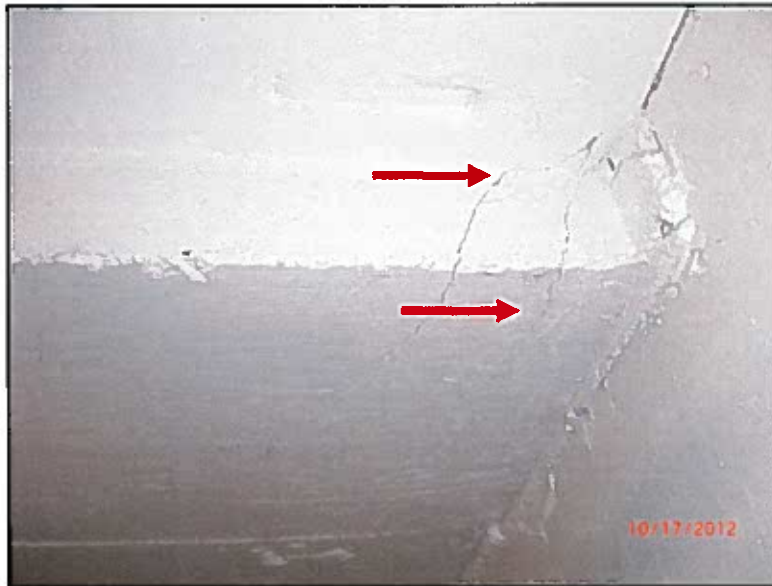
slab cracking at column drop panel between Parking Spaces 245 & 246
